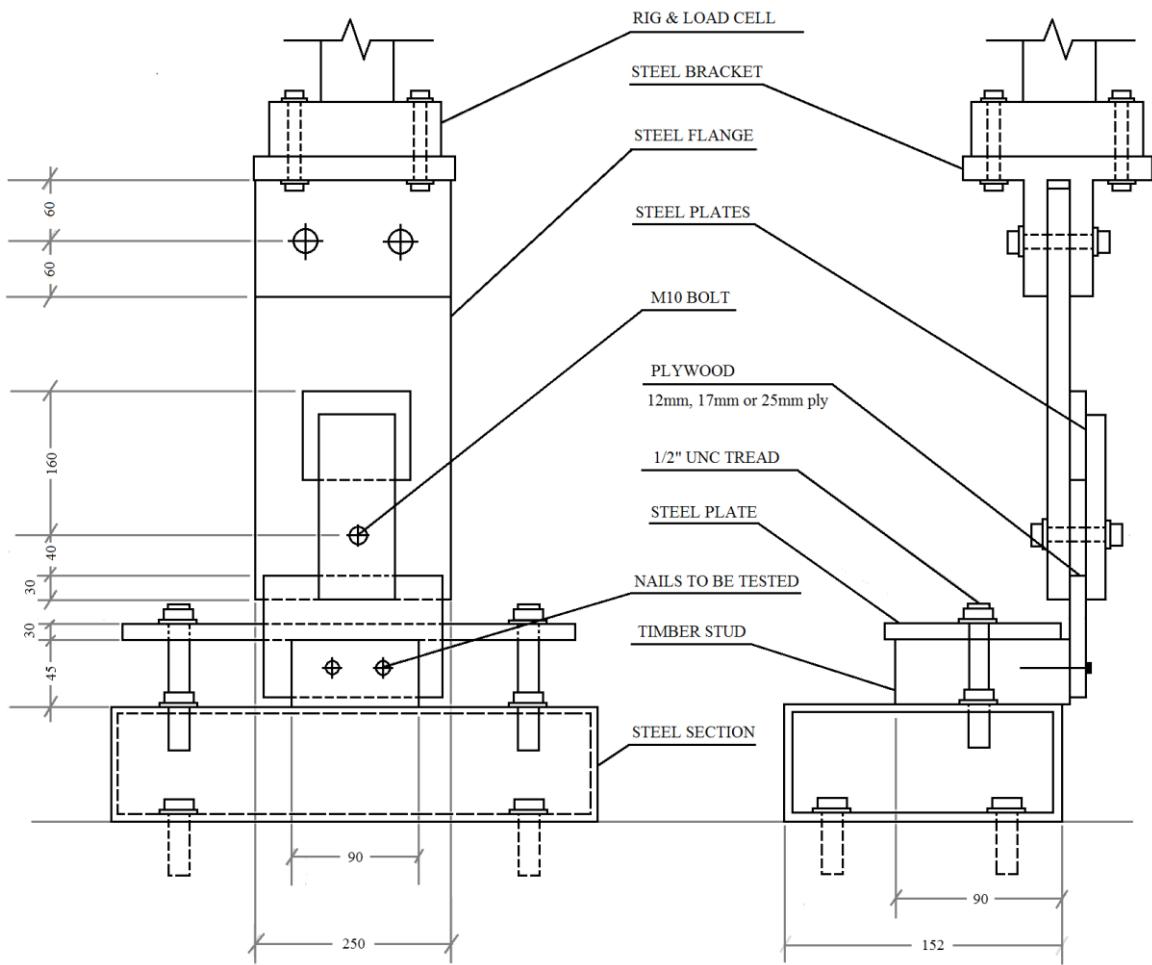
Dimensions and test setup of nailed timber-plywood connections
